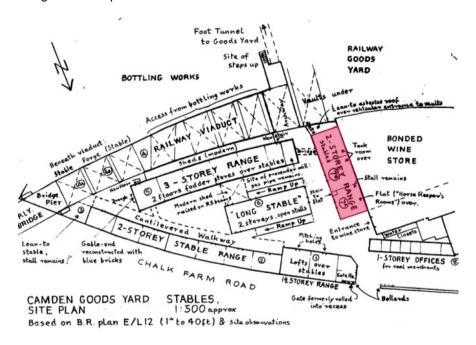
Site plan from 1975. The west elevation of the Tack Room (shown in red) is adjoined to the now demolished Bonded Wine Store.
